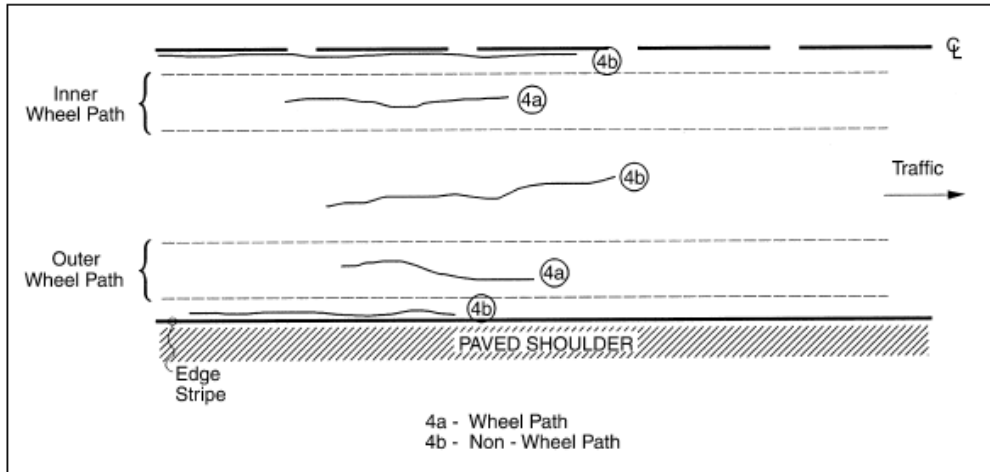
Longitudinal Cracking (FHWA, 2003)
